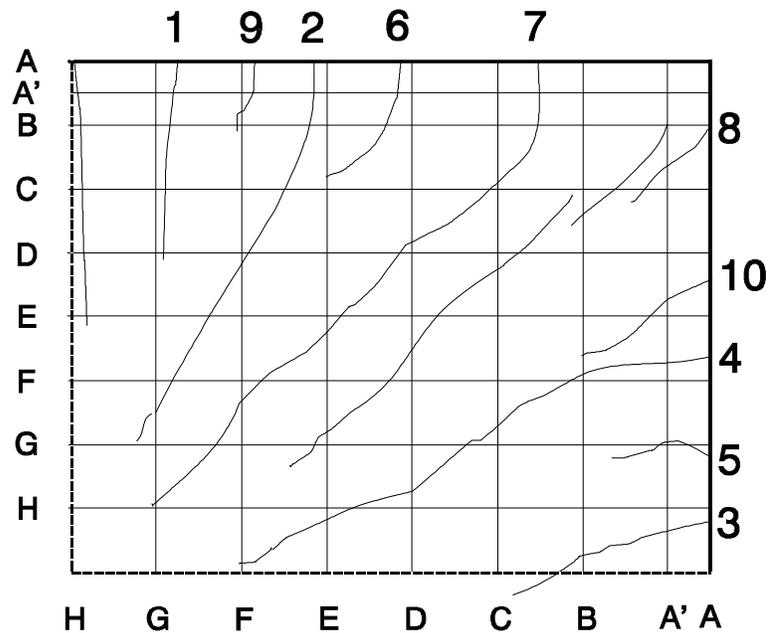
POJ-RC-100 cracking pattern on south face of joint at service load
